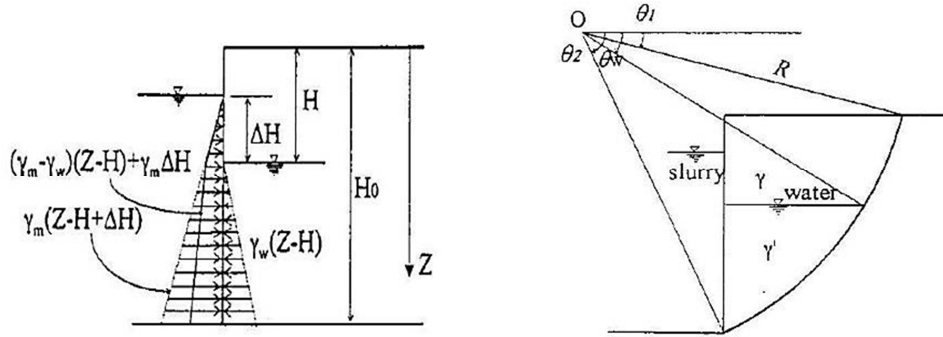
Schematic of the slurry trench wall. (Yu and Ugai 1997).
